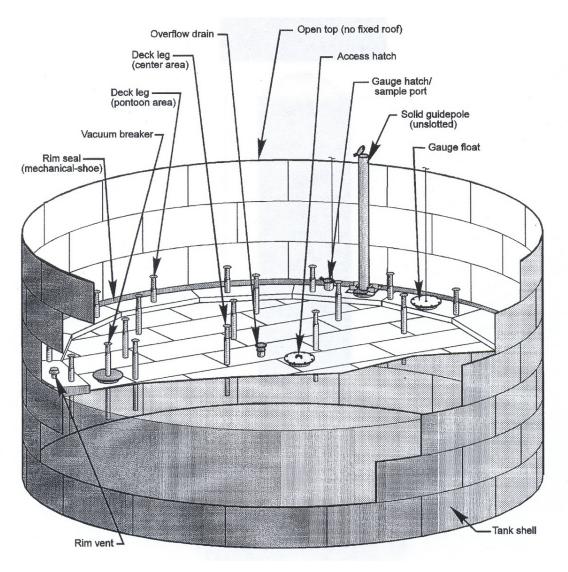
External Floating Roof Tank (source: U.S. EPA)
